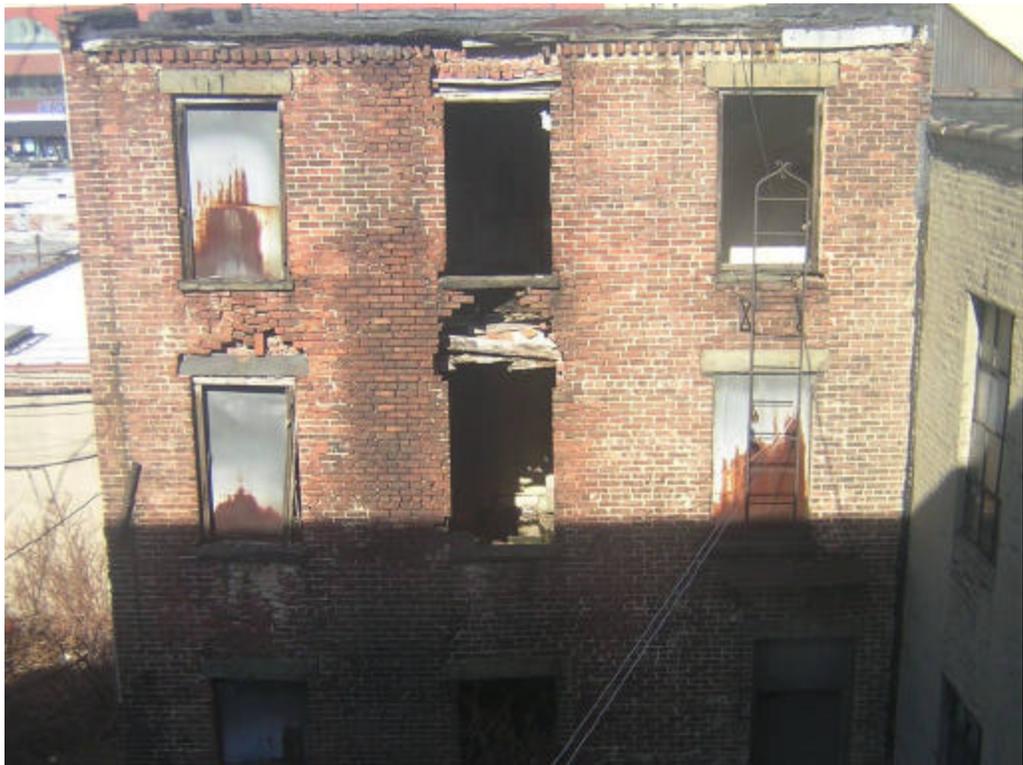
Collapsed & Damaged Portions of the Southern Non-Bearing Masonry Wall of 463 Dean Street
